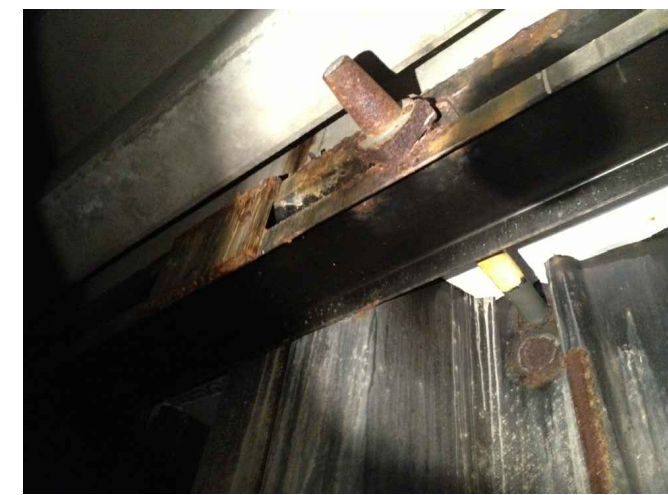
DETAIL VIEW OF STEEL WALER AND ANCHOR AT PAINTED SHEET PILED BULKHEAD WALL
